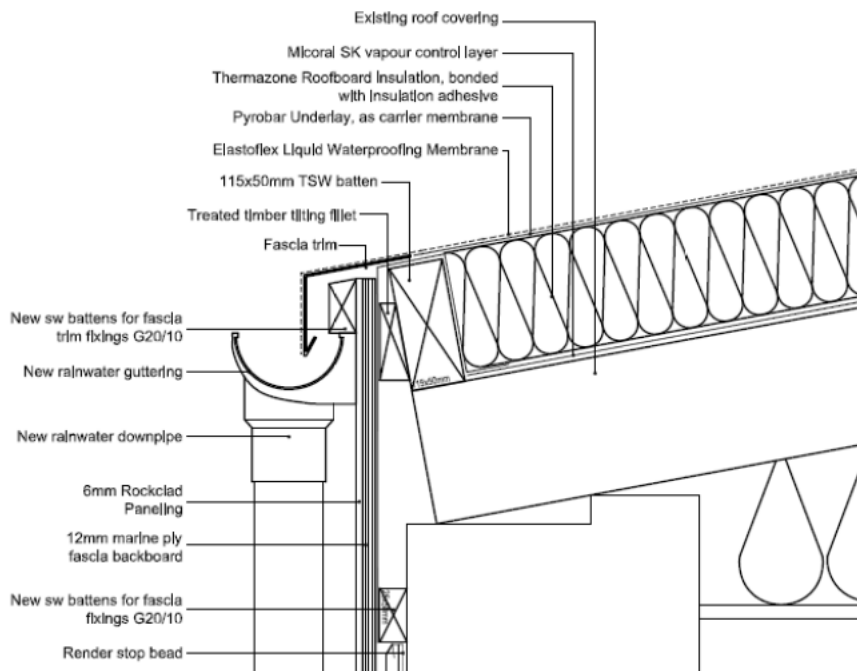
Section detail through eaves of refurbished 'flat' roof system (lower)
